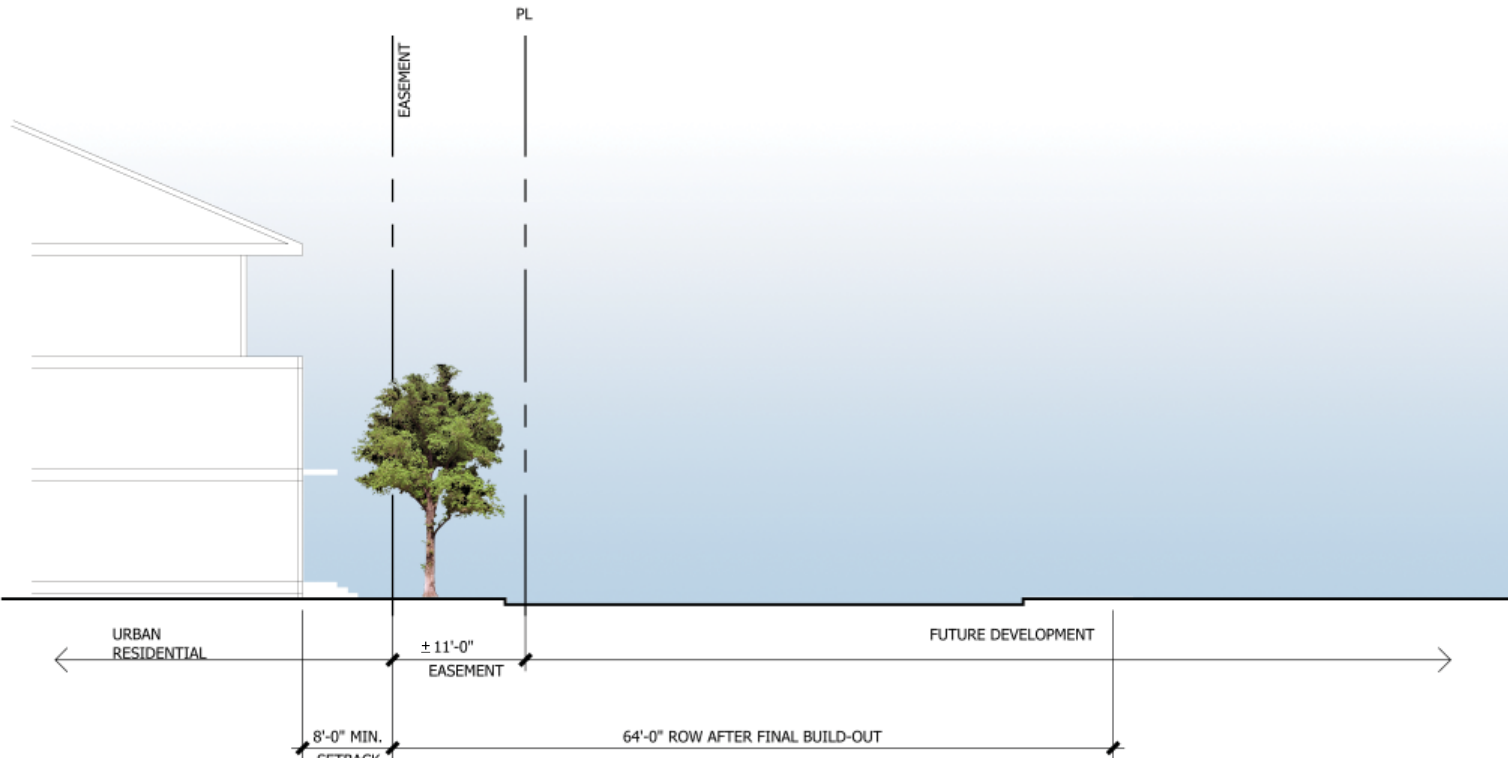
Tavis Place build-out under OWSBS Master Plan
